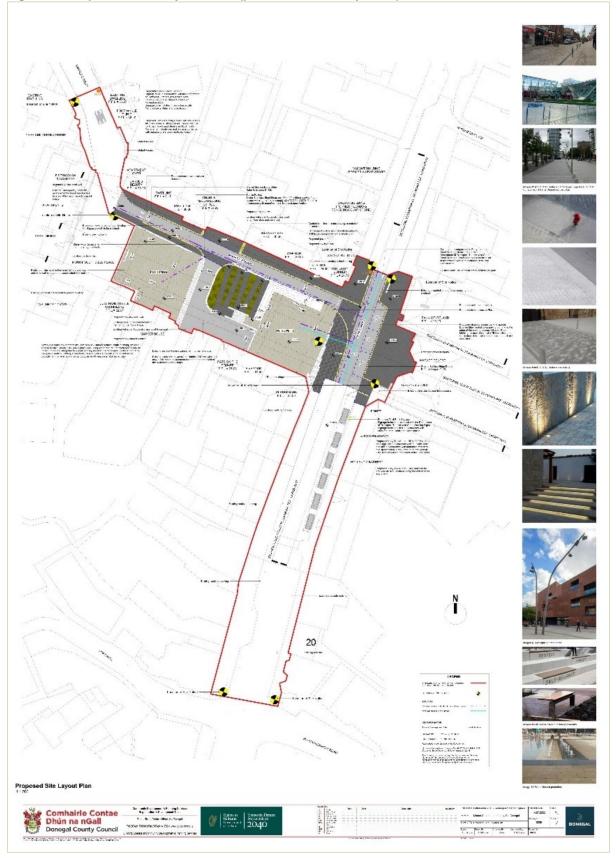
Proposed Site Layout Plan (published 21<sup>st</sup> July 2022)
